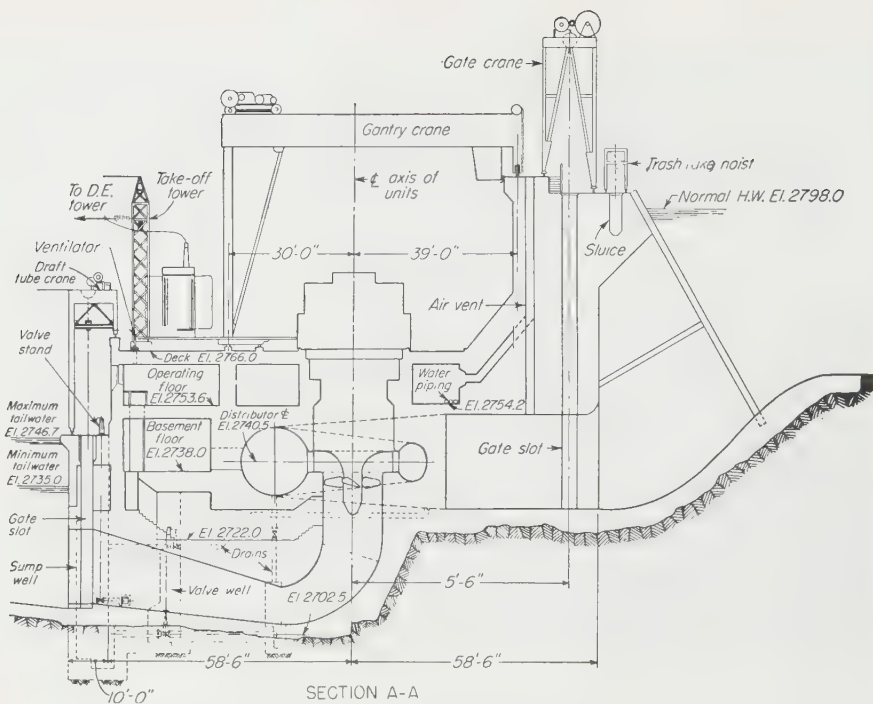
Lower Salmon River plant, Snake River, Idaho. (Ebasco, New York.)
